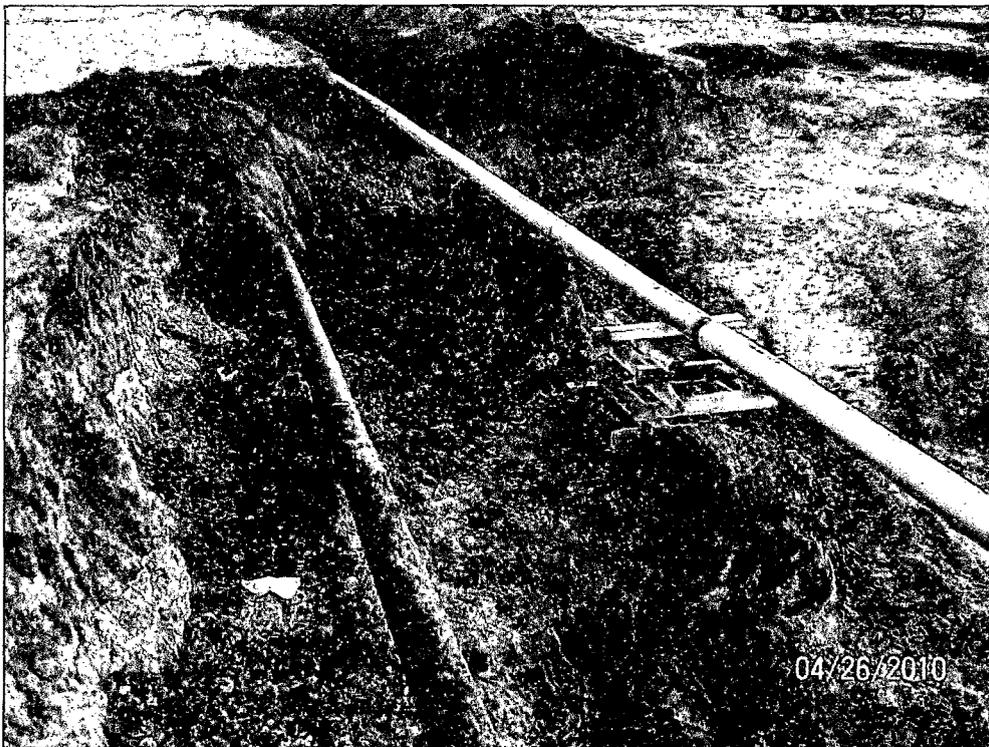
Looking at stockpiled blended impacted material and ROW excavation
